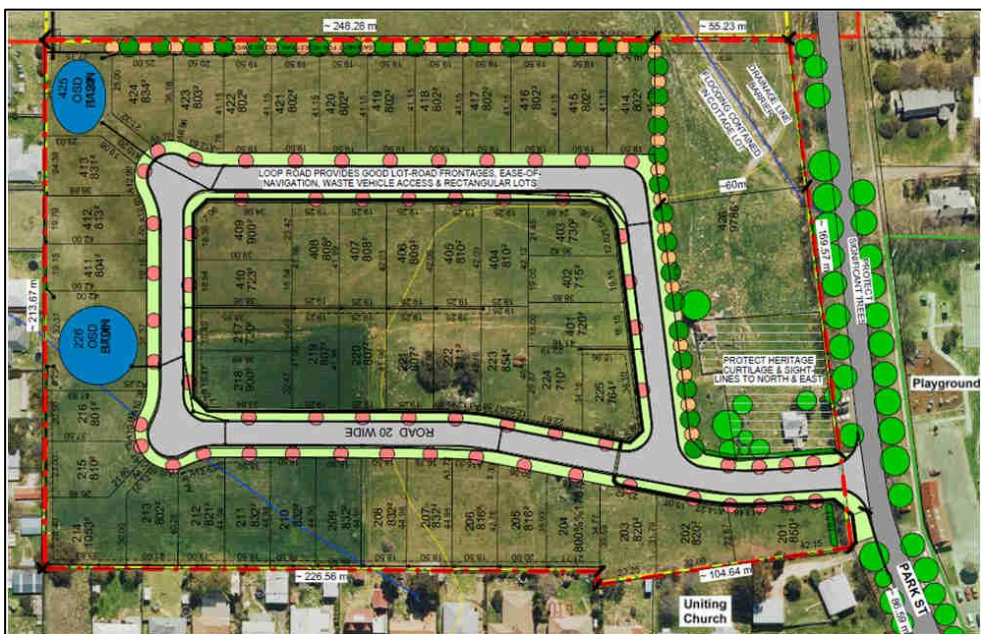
1279 Millthorpe Road, Millthorpe, proposed plan of subdivision.
